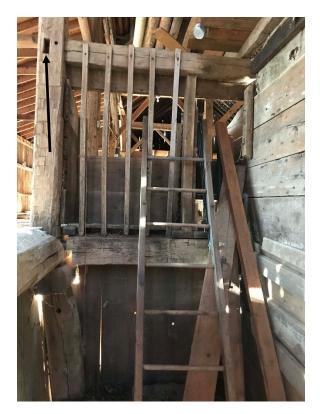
View looking west in Room G003 showing loss of a horizontal beam at the enclosure.
